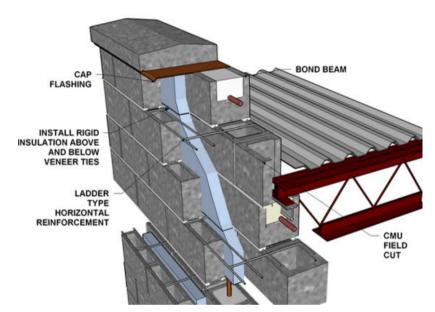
Horizontal Truss Type Joint Reinforcement and Bond Beam
